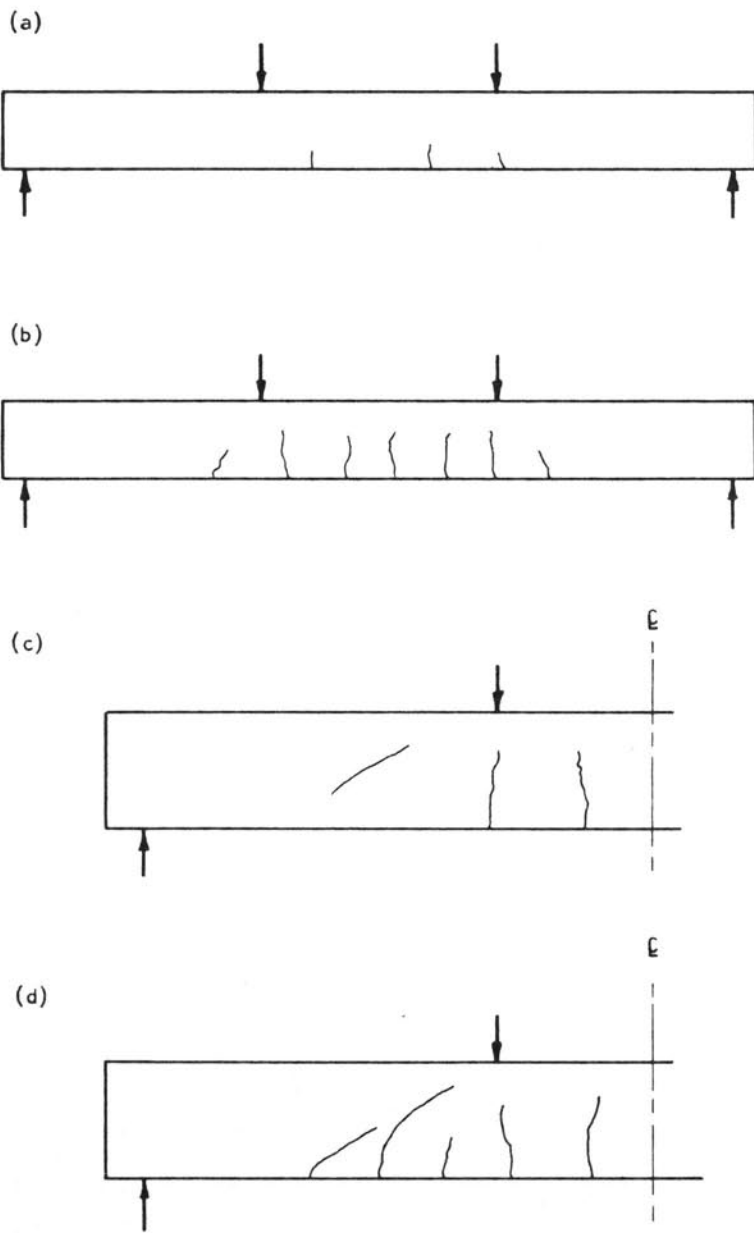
CRACK DEVELOPMENT IN PRESTRESSED BEAM
